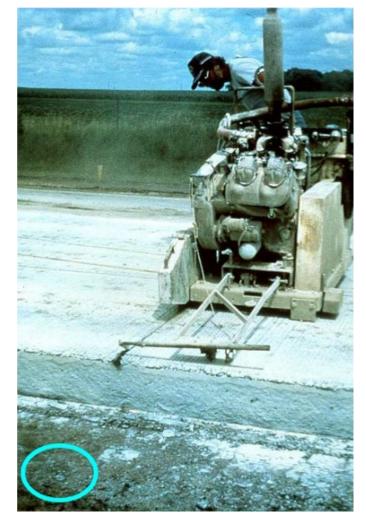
Use of nail and washer in shoulder (see circled area) to mark existing joint line prior to overlay placement and joint sawing
